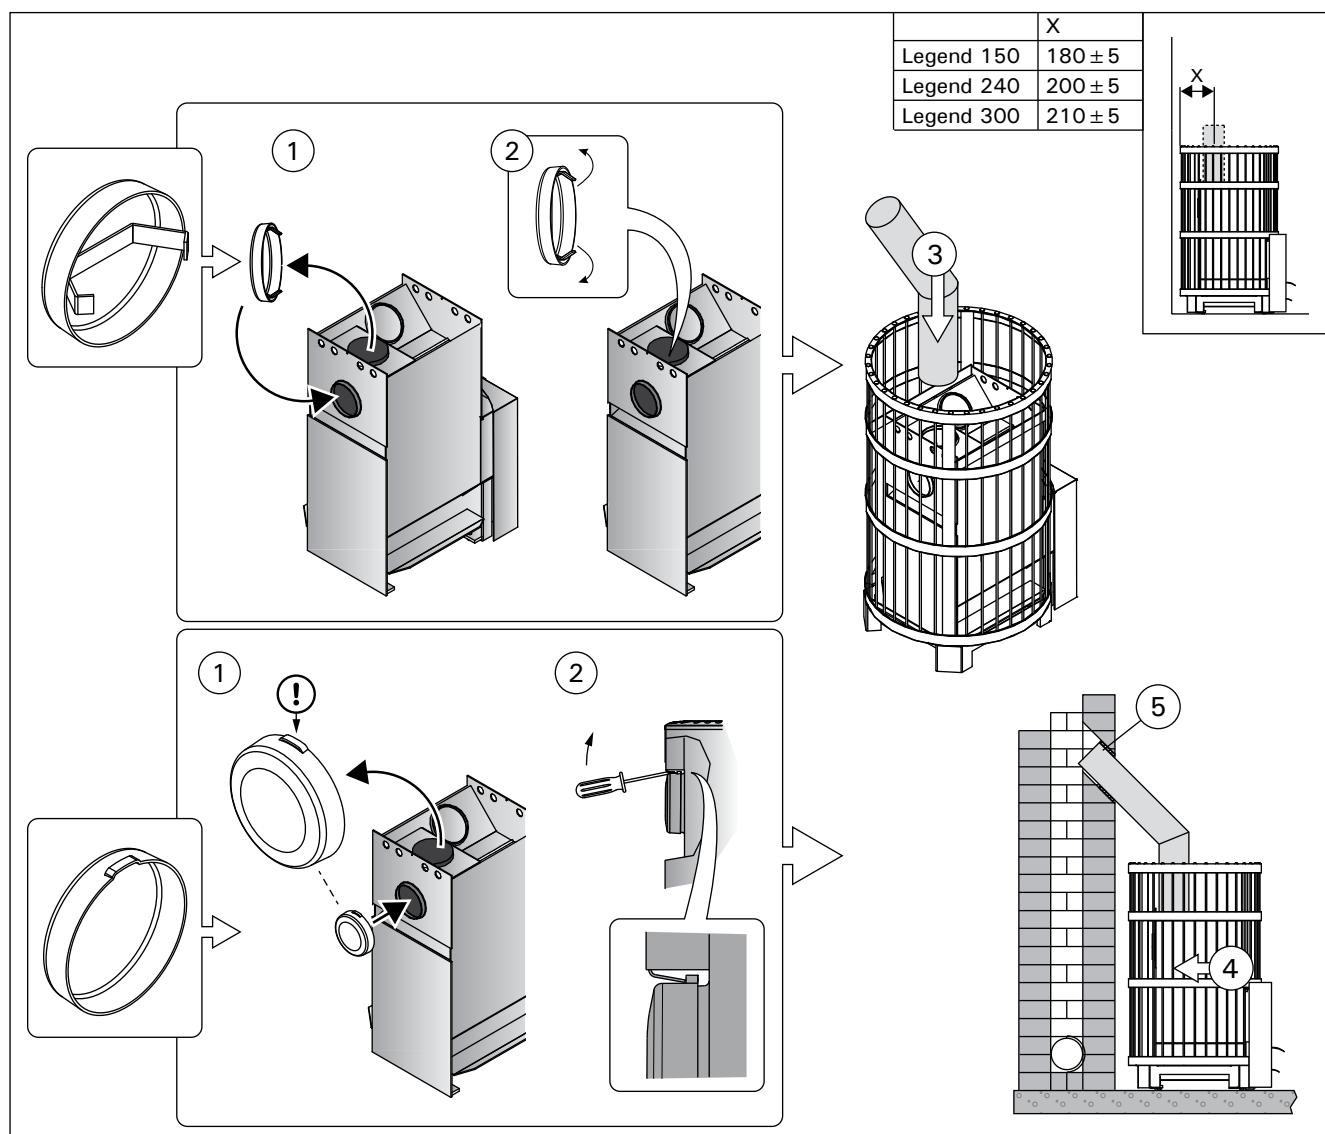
Connecting the stove to a masonry flue via the upper connection opening (all dimensions in millimeters)
